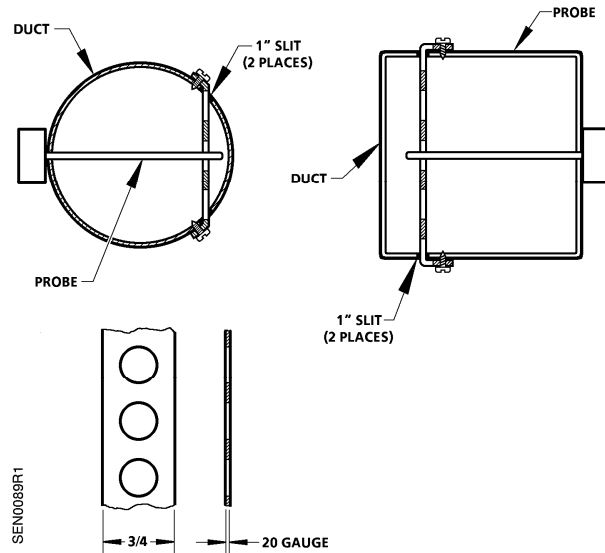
Steel Hanger Used to Support Sensor Probe Tip.
